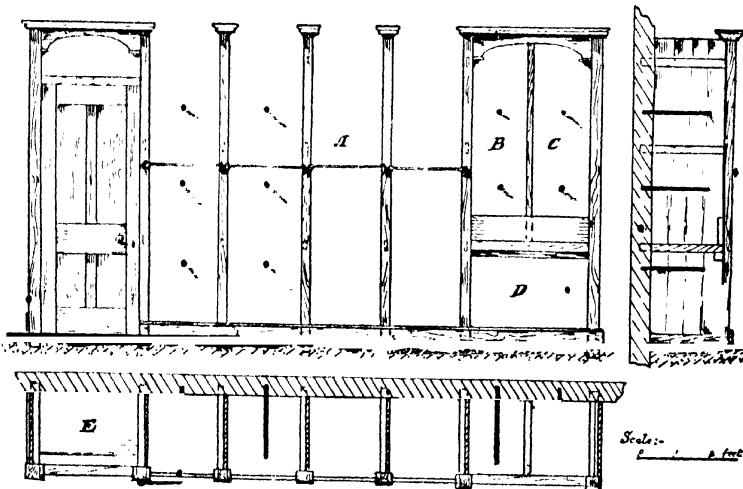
DRAWINGS OF A RACK FOR TIMBER STORAGE
